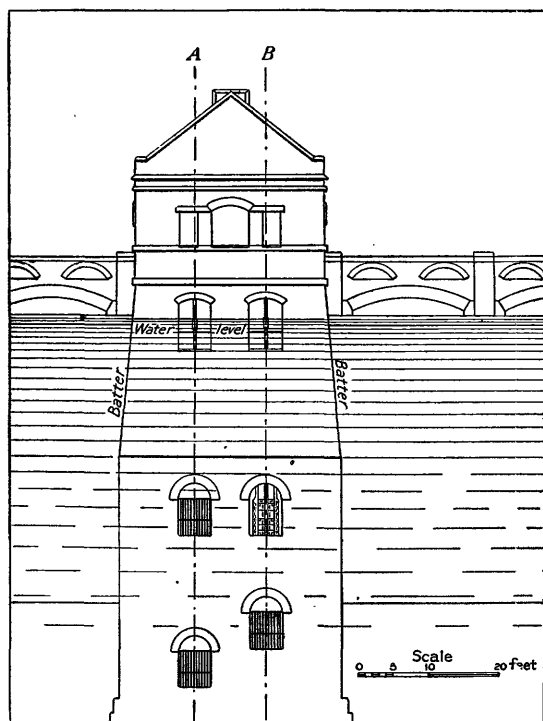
Rear elevation of valve house at Scranton Lake dam.
